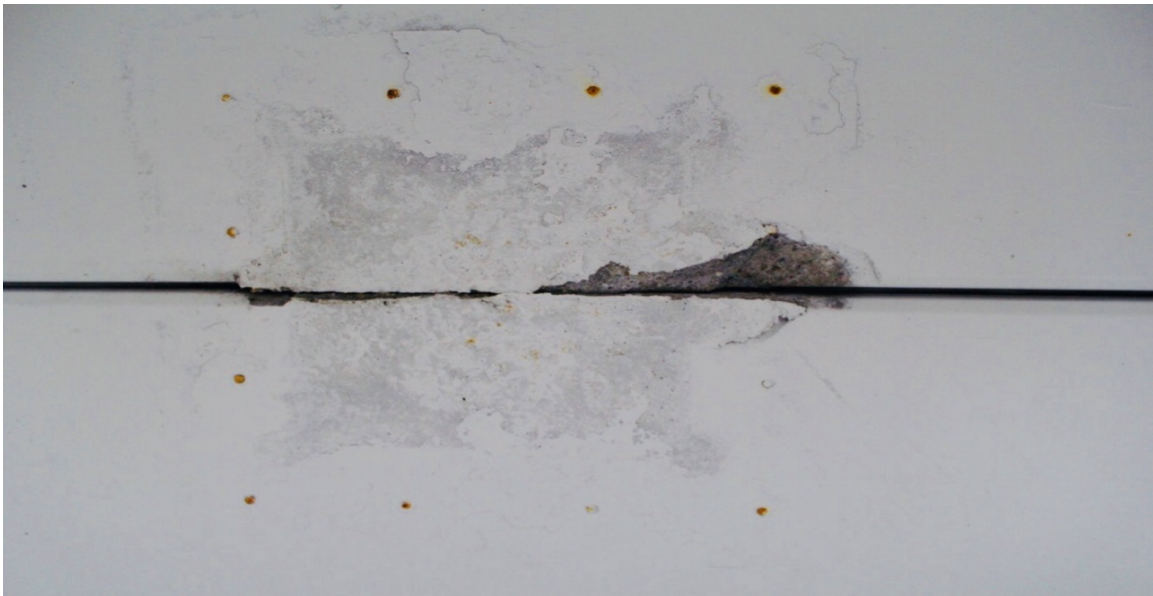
Repaired section of the Lincoln Parking Deck showing signs of spalling.
